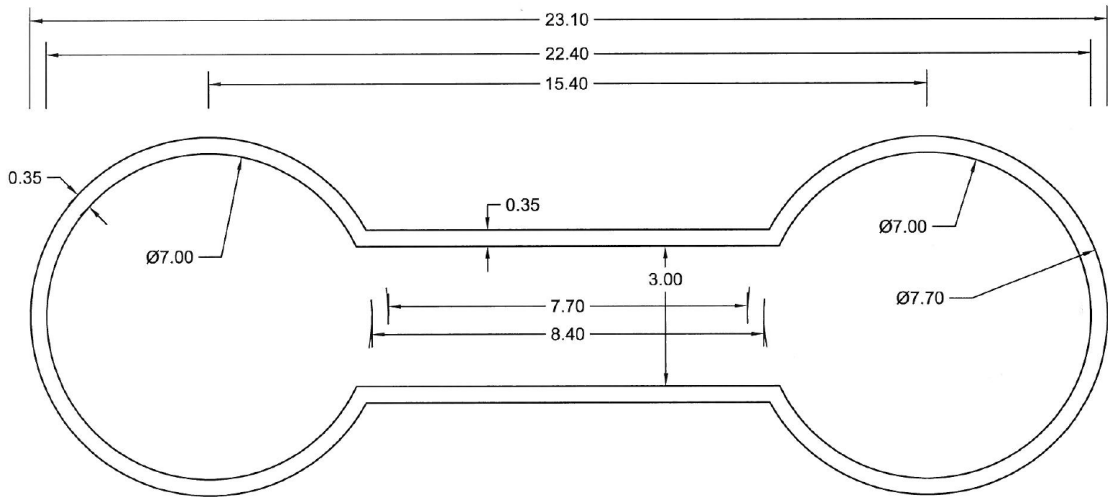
Schematic of the Twin Bore Tunnel Section
